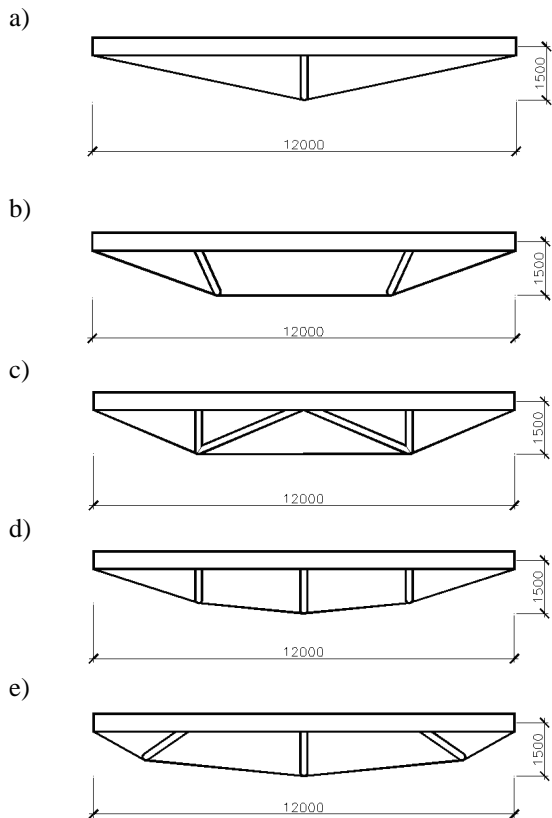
Types of the trussed steel beams: a) – type with the central pillar; b) – type with the inclined edge struts; c) – type with the inclined central struts and edge pillars; d) – type with the vertical edge and central pillars; e) – type with the inclined edge struts and vertical central pillar.
